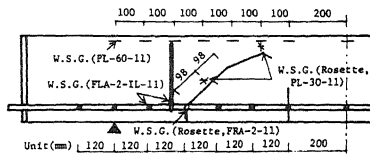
Positions of Wire Strain Gauges on Tension Reinforcement, Stirrup and Concrete
